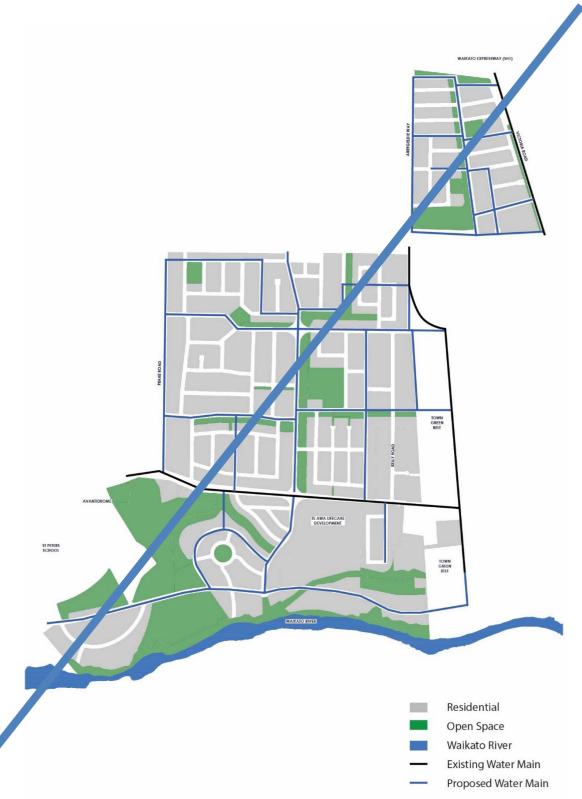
Indicative Water Network, C1 and C2/C3 Structure Plan Areas [DR7: 3/1, 11/1, 14/57, 14/61, 22/3 and 23/1]
